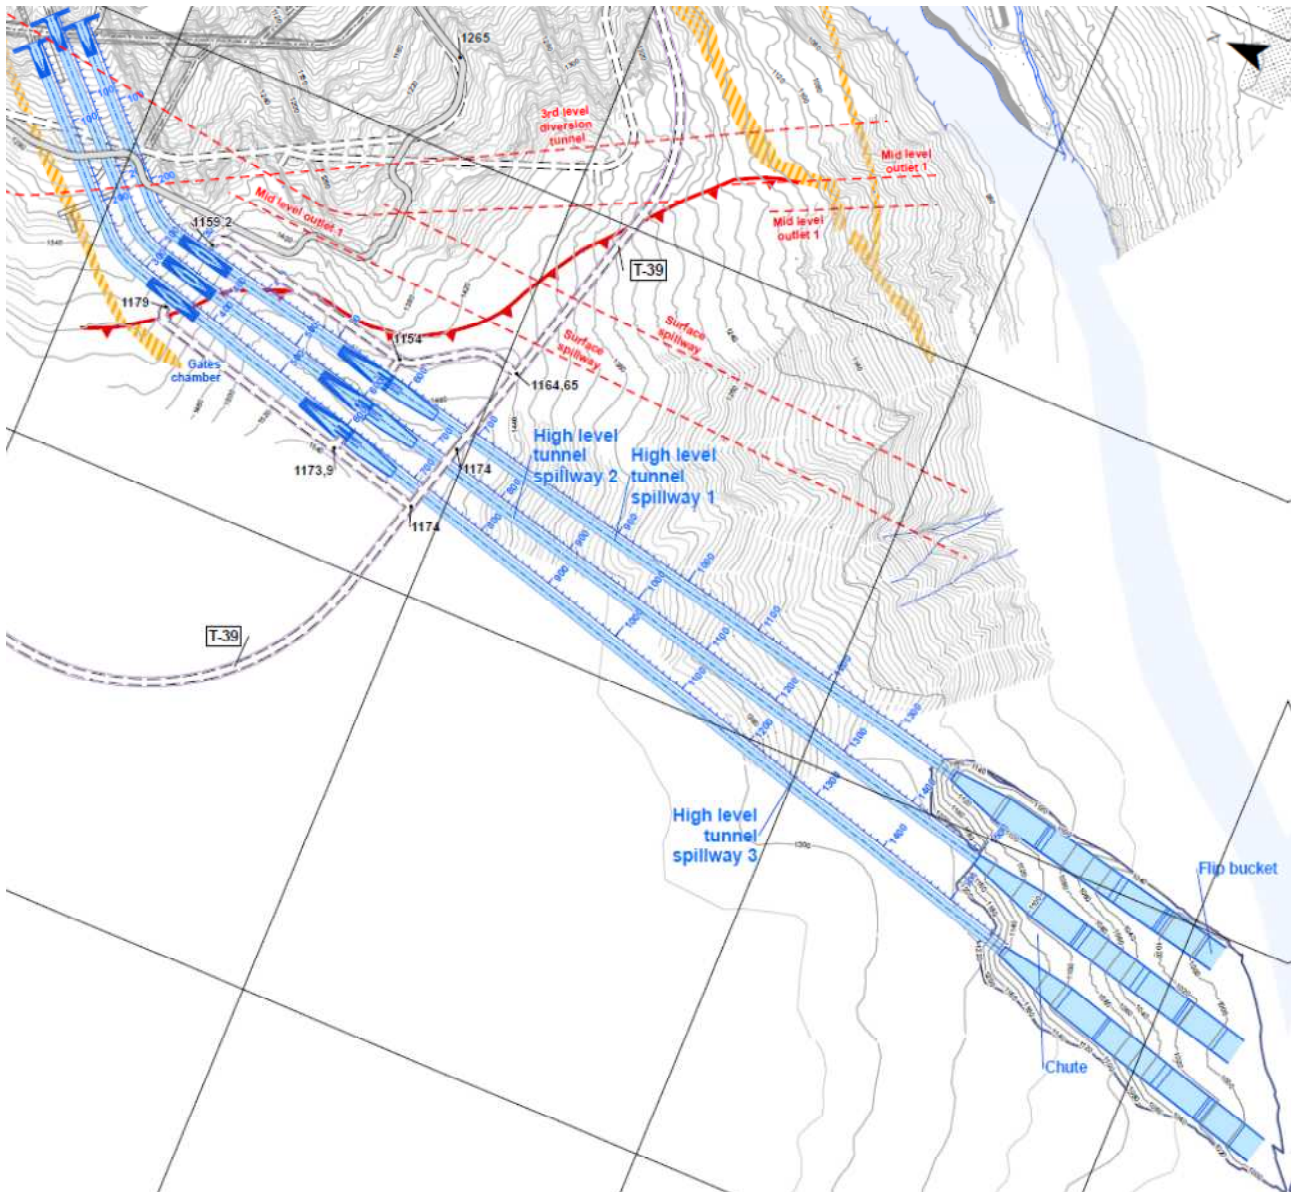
Layout of the high level tunnel spillways, alternative with dam crest el. 1265 ma.s.l.
